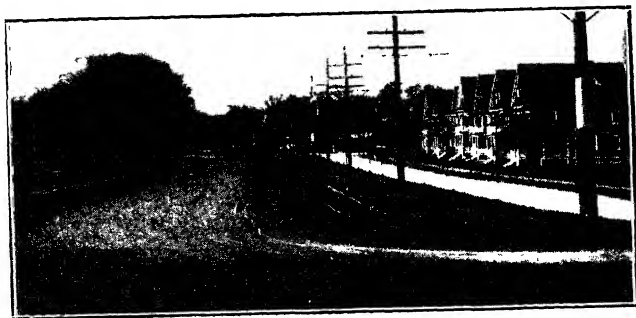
STREET RAILWAY TRACKS ALONG SIDE OF ROAD. AUBURNDALE, MASS
